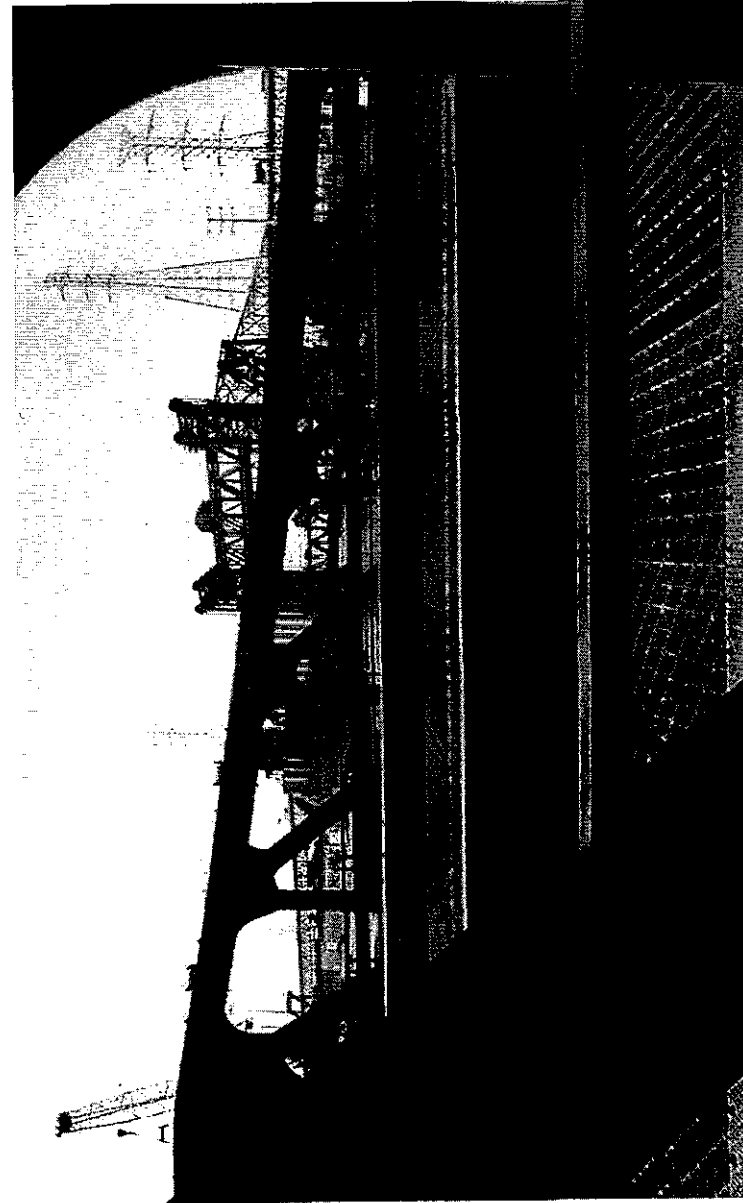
95th Street Bridge. View south toward railroad bridge, Calumet River, Chicago, 2002. Photograph by Gary Cialdella, www.calumetregionbook.com
